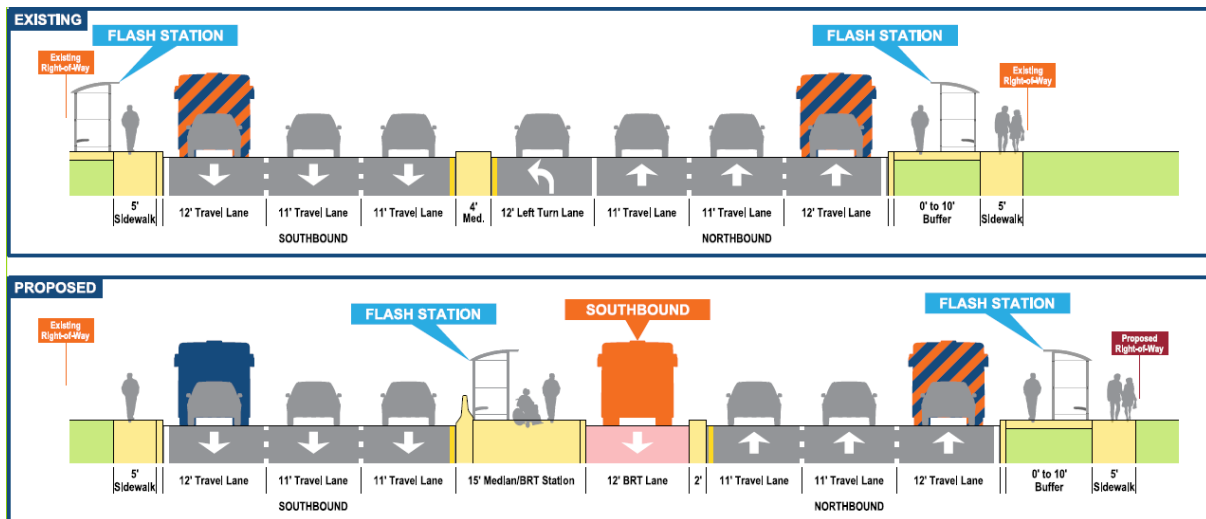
Existing and Proposed Cross-Section from Burnt Mills Shopping Center to Lockwood Drive
